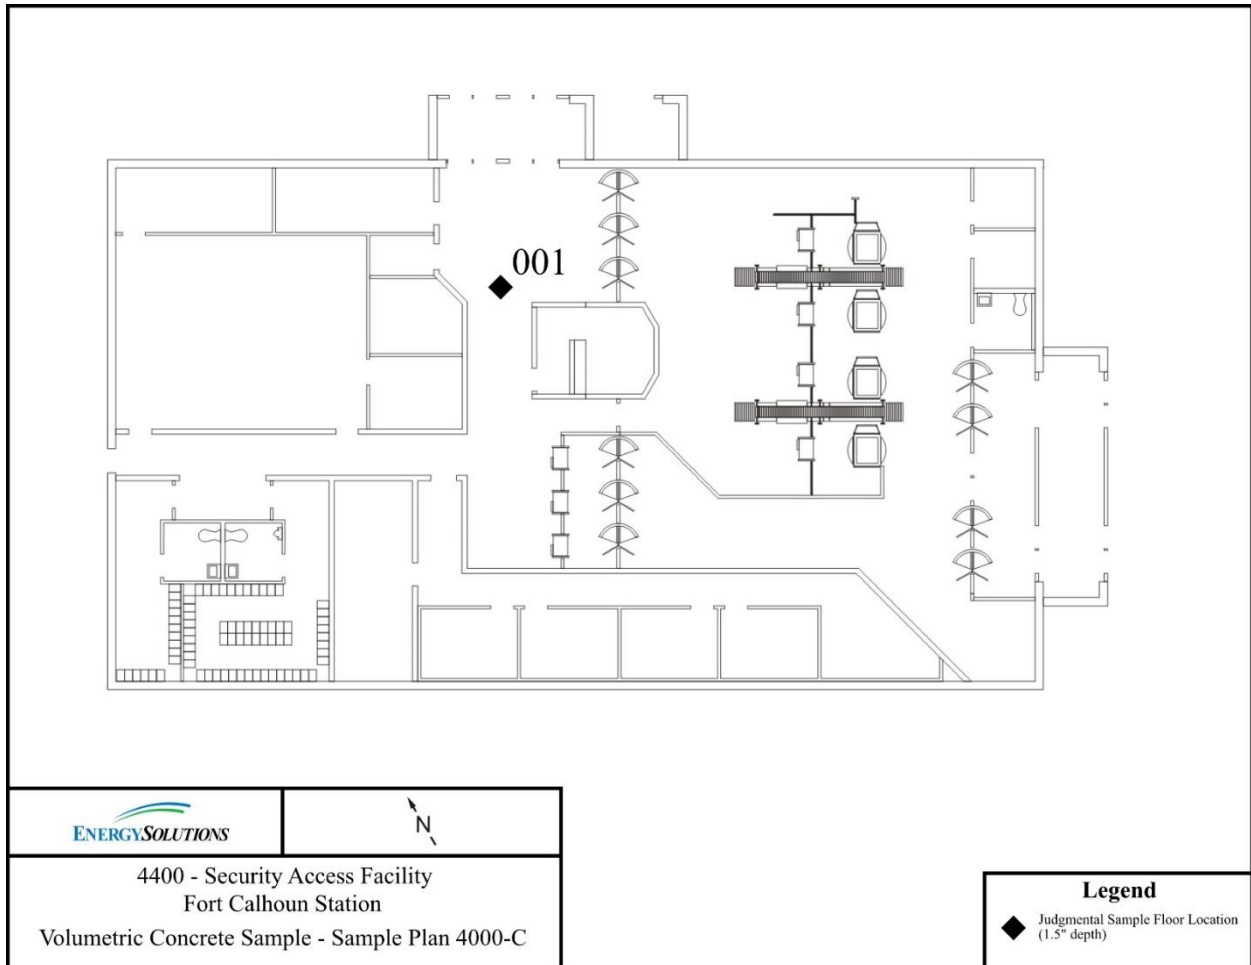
Volumetric Concrete Sample Location in Security Building
